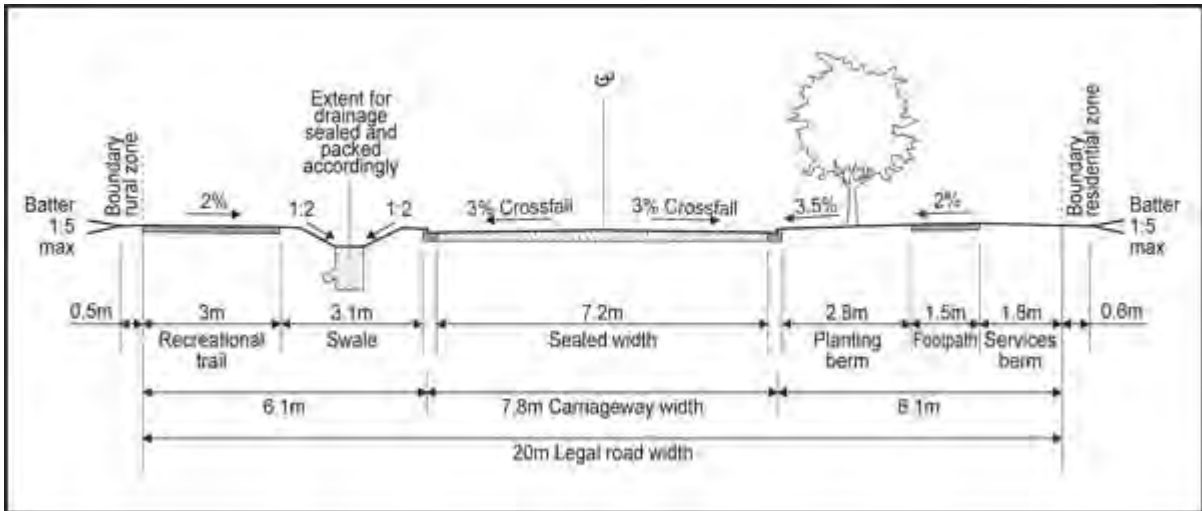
Proposed road west of Clevedon Sub-precinct D
